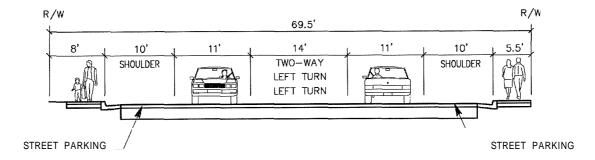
Segment 1 - Interim Roadway Section with Street Parking (Looking East)
